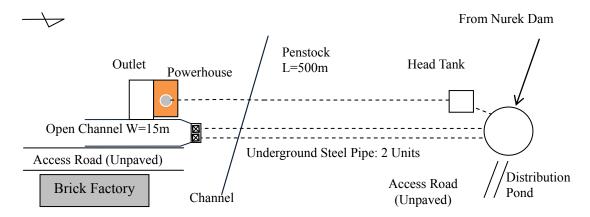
Power Facility Plan at Nurbakhsh Site
